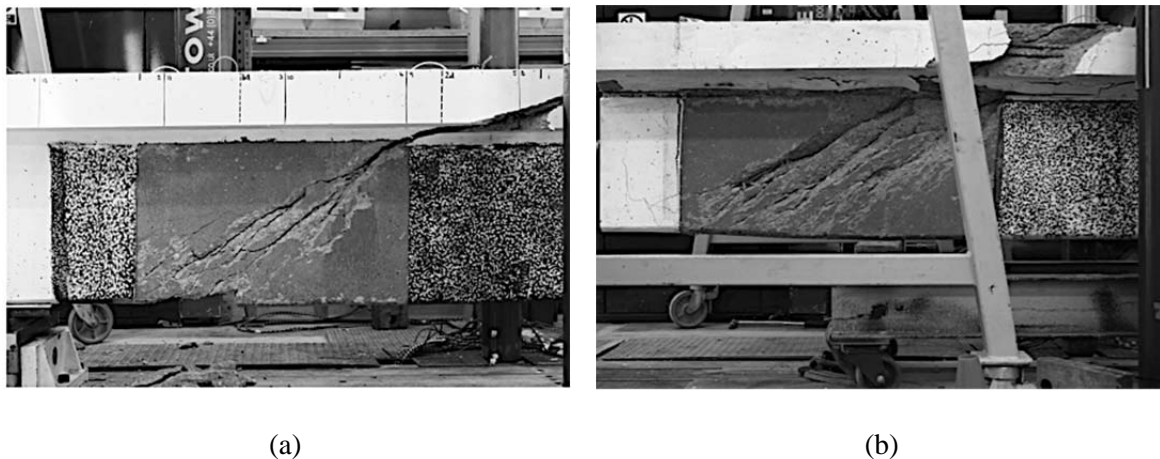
Lightly strengthened beam failure modes: (a) specimen LB1U, (b) specimen LB1UA.
